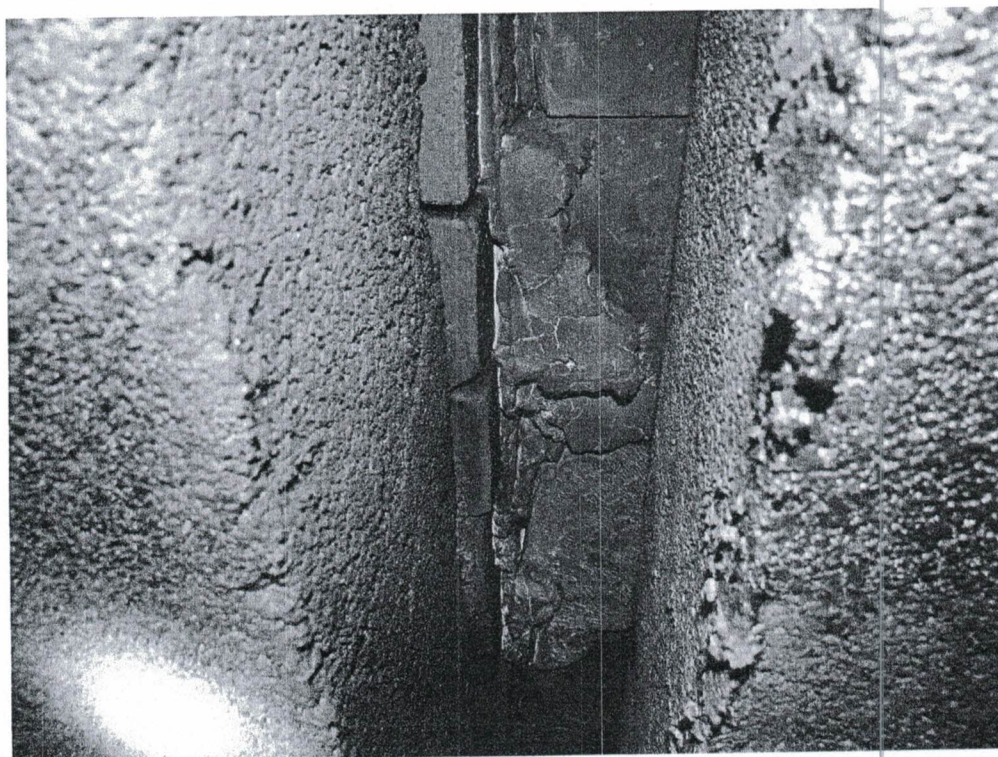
Damaged drywall along the rear exit from the second floor. Icicles are present coming down from the attic and around the attic access hatch.
